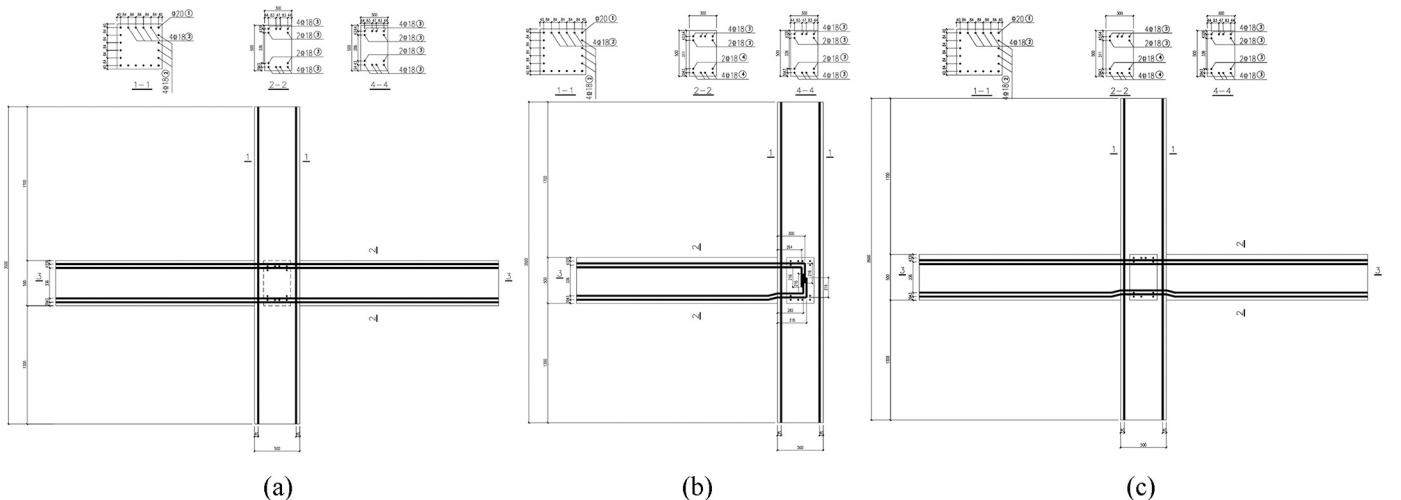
Design drawing of RC beam-column joints: (a) + Joint (b) T Joint (c) + Joint (with another form of rebar).
